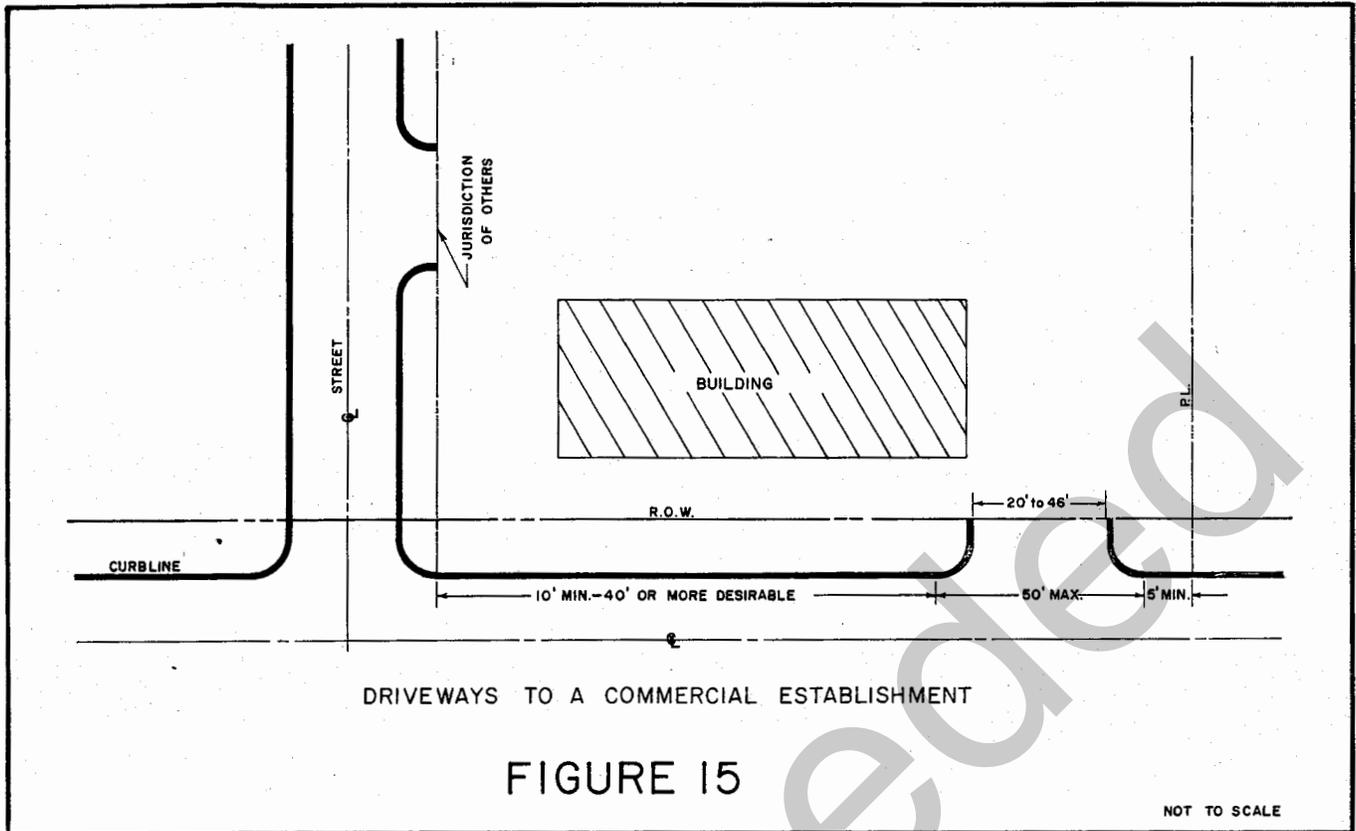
DRIVEWAYS TO A CORNER COMMERCIAL ESTABLISHMENT: Figure 15 shows driveway connections to a commercial or industrial establishment in an urban or suburban area. There is a single entrance (50) feet maximum curbline opening from the main highway and a secondary entrance from the side street. A curbed section is shown, and there may or may not be sidewalks. The corner clearance should be greater than the suggested ten (10) foot, if at all possible.
